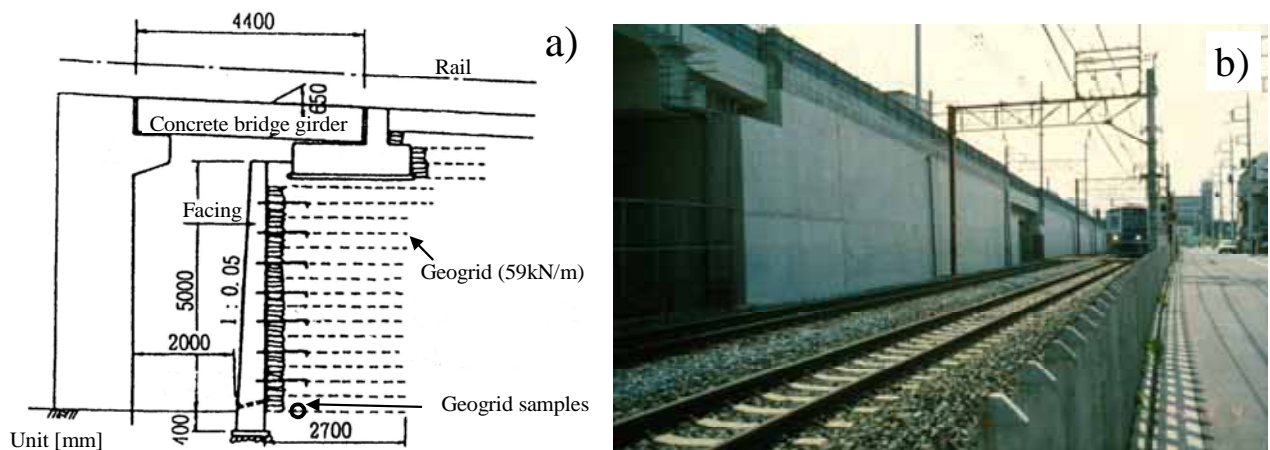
a) Cross-section of one of the GRS bridge abutments; and b) GRS bridge abutments for Seibu Line, Tokyo (Tatsuoka et al., 1997).
